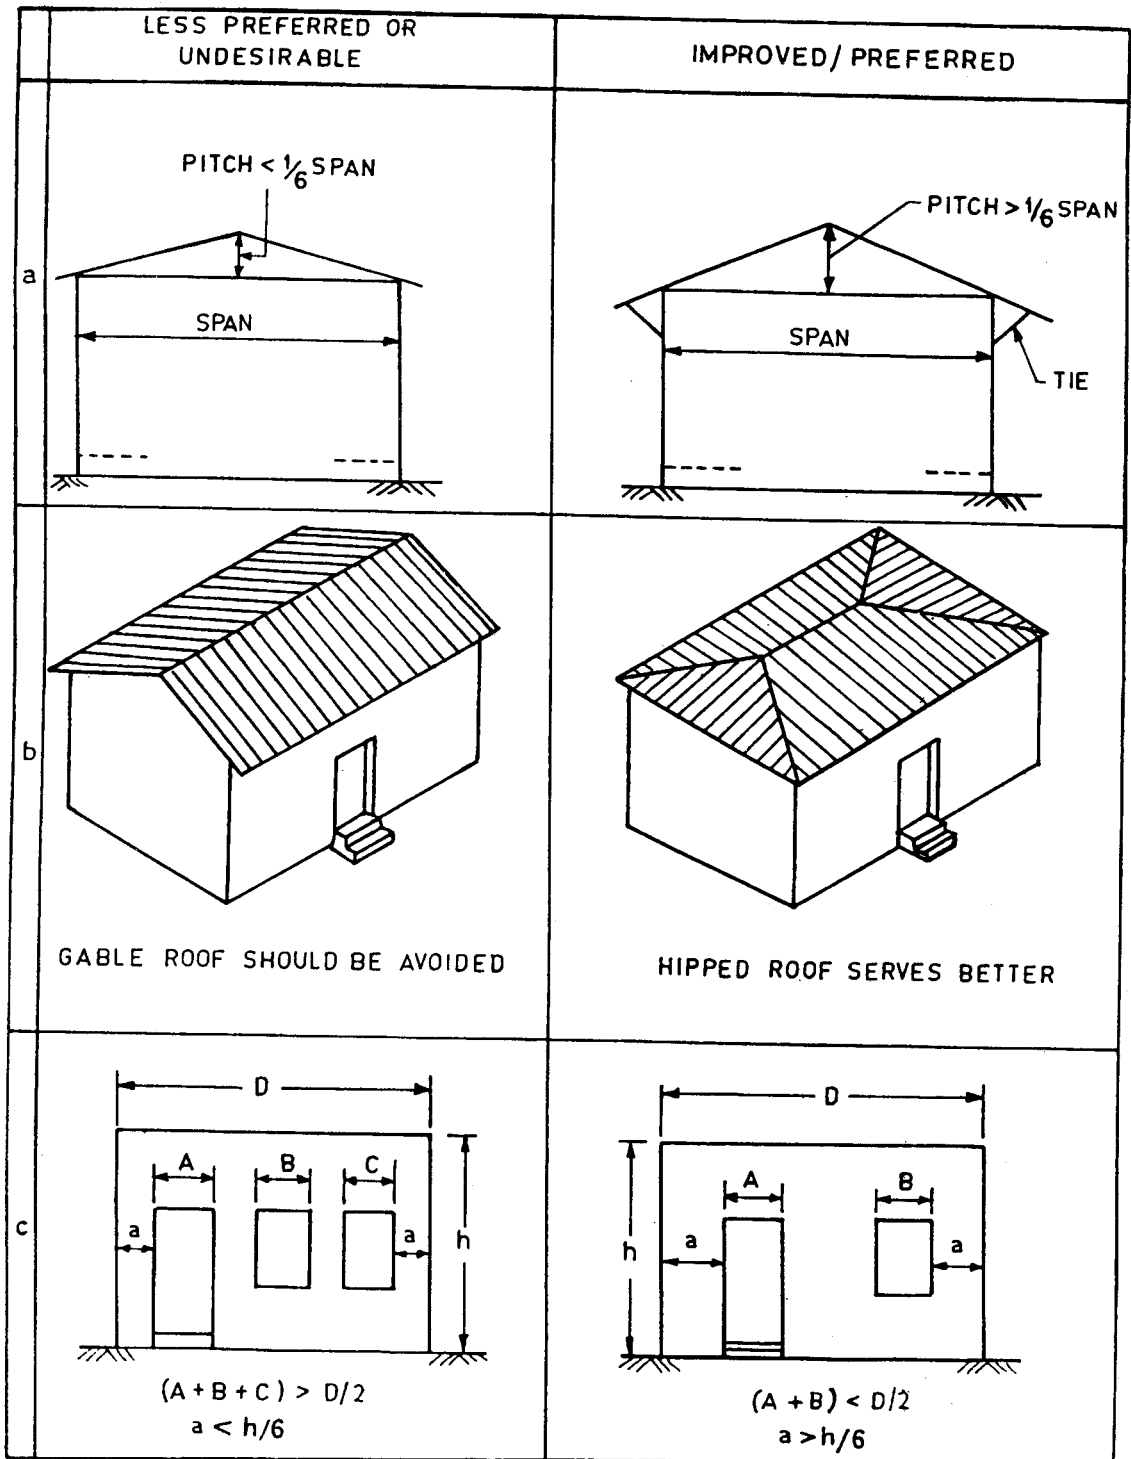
IMPROVEMENTS FOR ROOFS AND WALLS OF BUILDINGS TO REDUCE DAMAGES DUE TO CYCLONES
